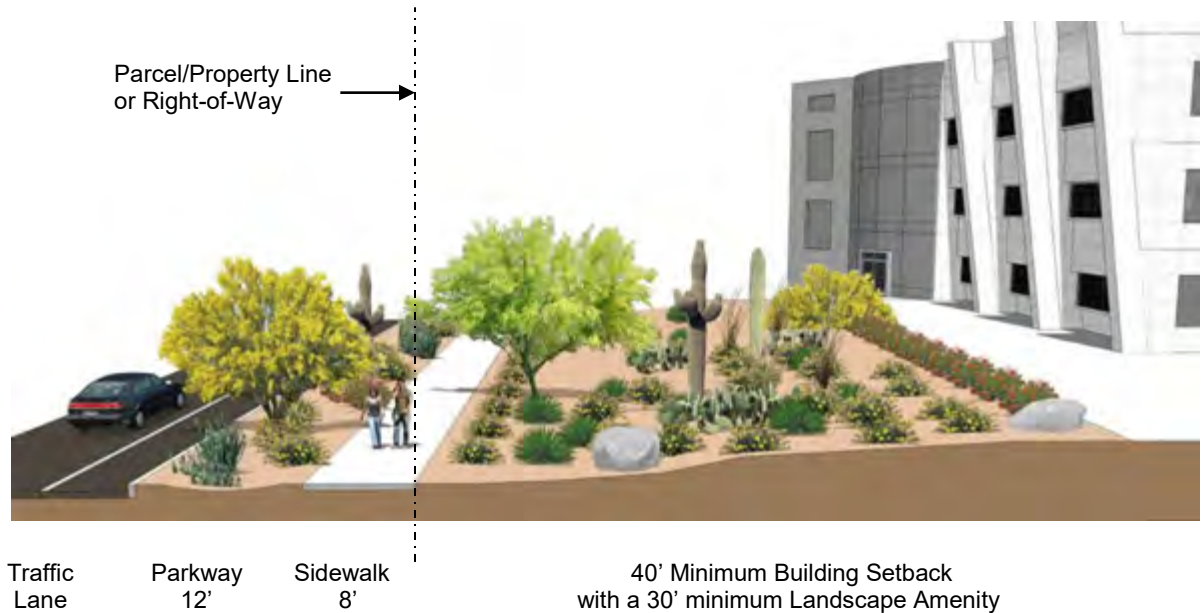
Building Setback and Landscape Amenity for Primary and Secondary Streets.
